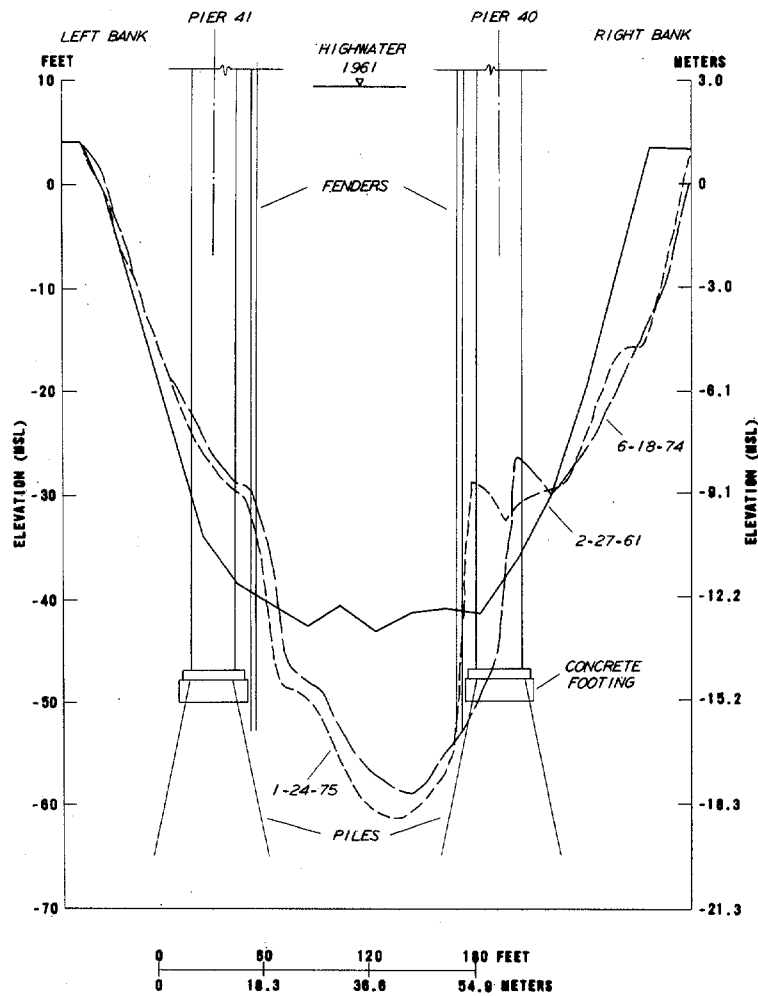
Changes in channel cross section between 1961 and 1975, 38 feet (11.6 meters) downstream from centerline of bridge.
